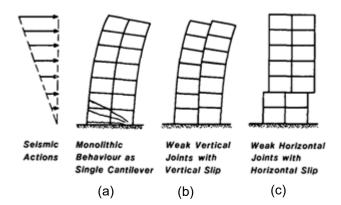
Seismic behavior of a prefabricated shear wall constructed using large panel shear walls: (a) monolithic behavior, (b) vertical slippage between the panels, and (c) horizontal slippage (source: UNIDO, 1983).
